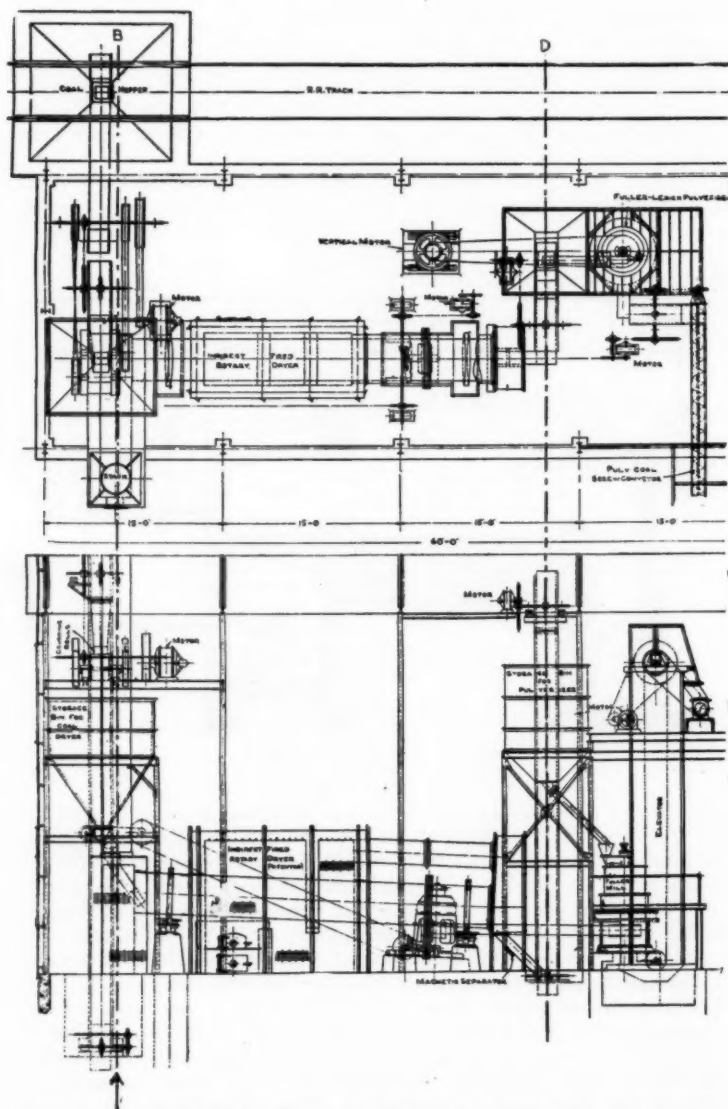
PLAN AND ELEVATION OF PLANT FOR PULVERIZING COAL.
